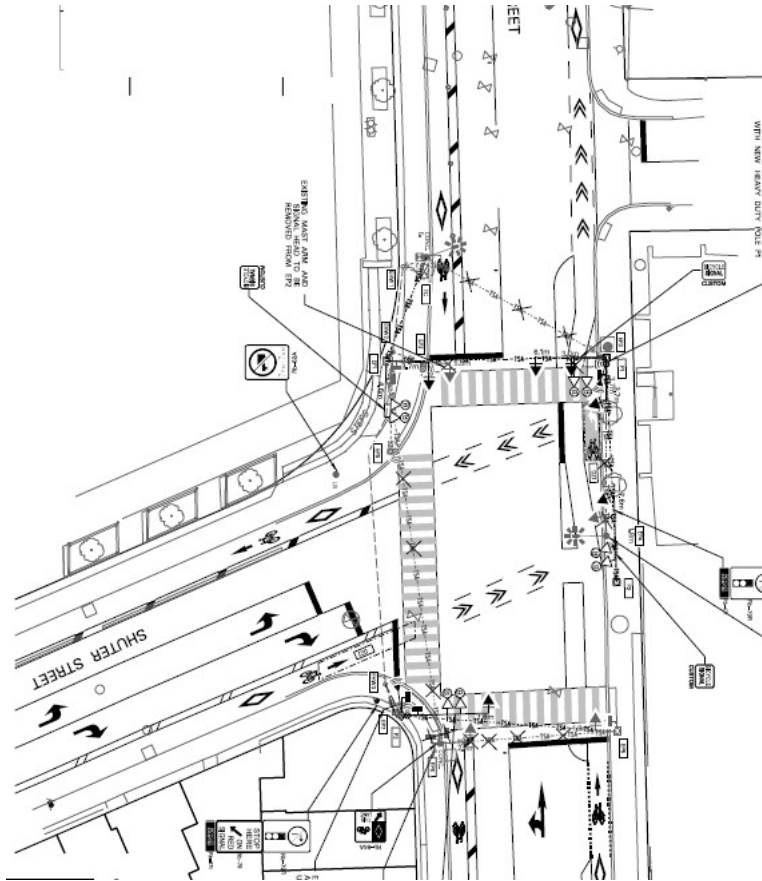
The draft pavement marking plan proposed to be implemented at the River Street and Shuter Street intersection in 2022-2023.
